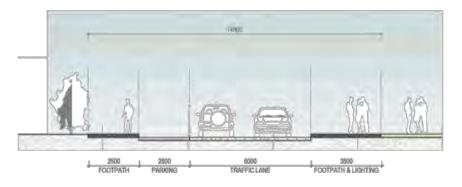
14.6m Wide Streets - Typical Section (Source: Ryde DCP 2014)
